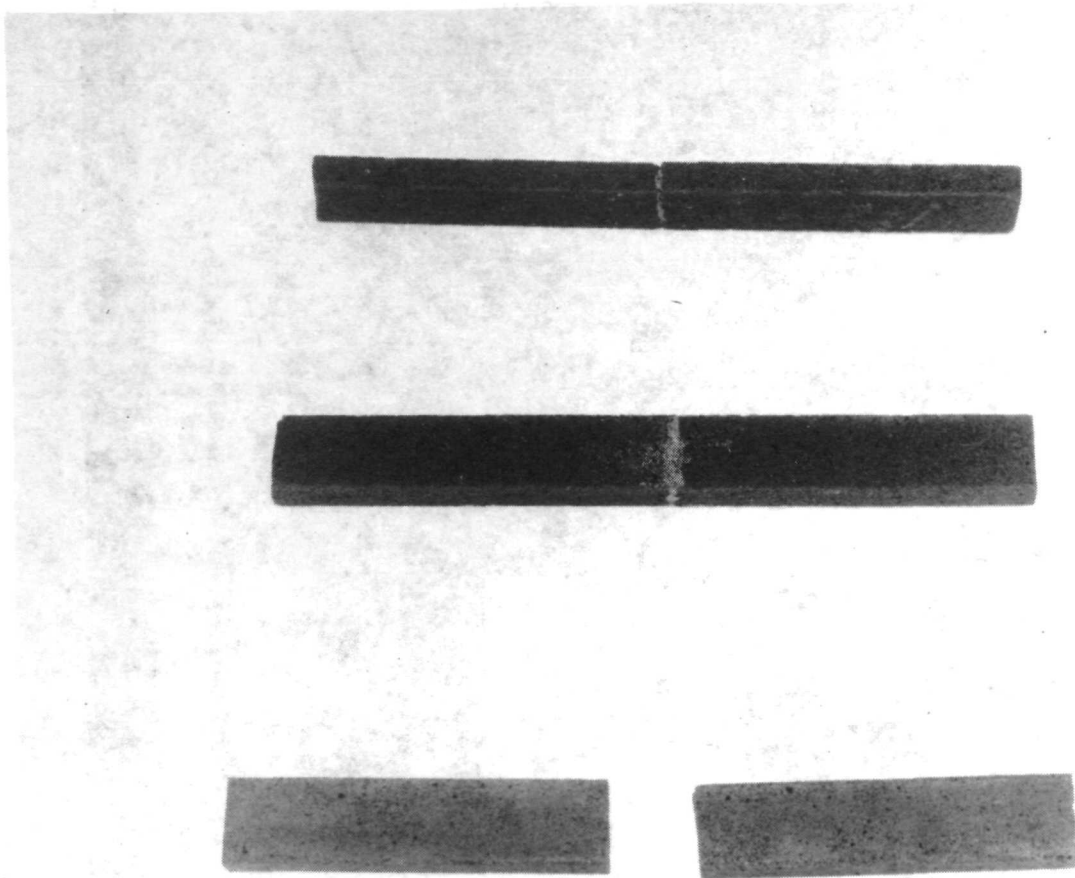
Beam Specimens Used in Single Center Point Flexure Tests. Failure occurs at midspan, under loading point.
